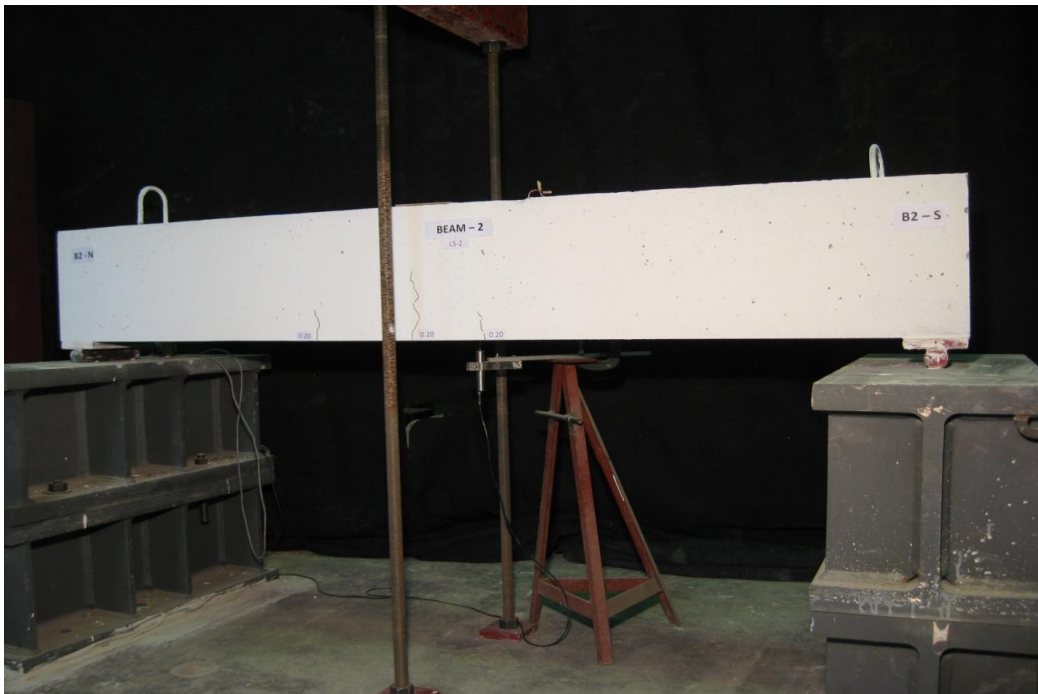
Cracking pattern for beam 2 at a load of 28.2kN (B2-LS2)
